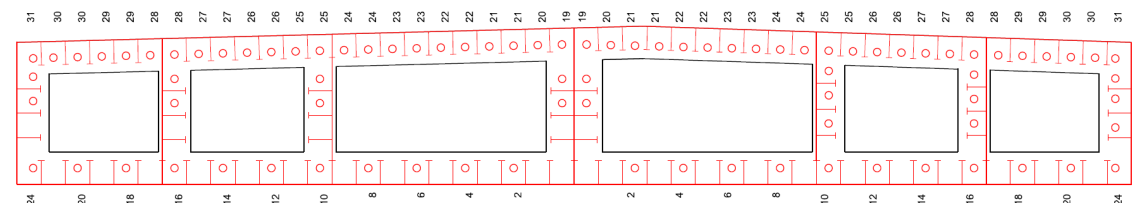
Post-tensioning arrangement at the joint in abutment South (showing number of 0.6" strands per tendon). Center distances are 600 mm (or multiples of) for PT as well as for stiffeners.
